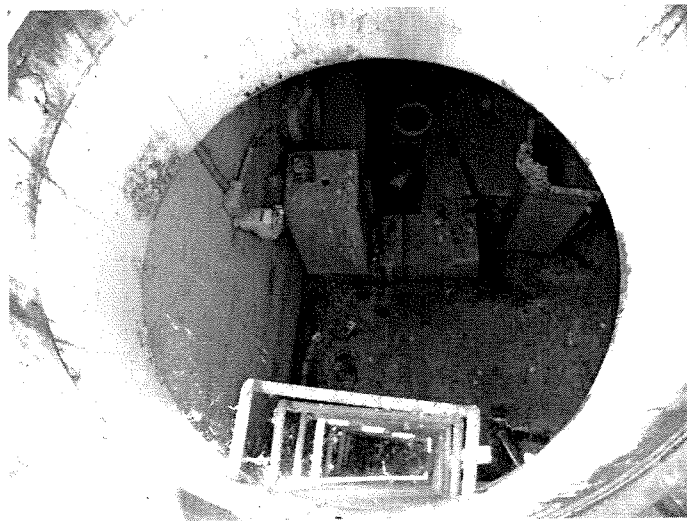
Fan Room for Test Stand No. 3 (Unit 137), Beta Test Complex, 1963-1964. Looking into the structure, with the access hatch up. View of May 2005.
